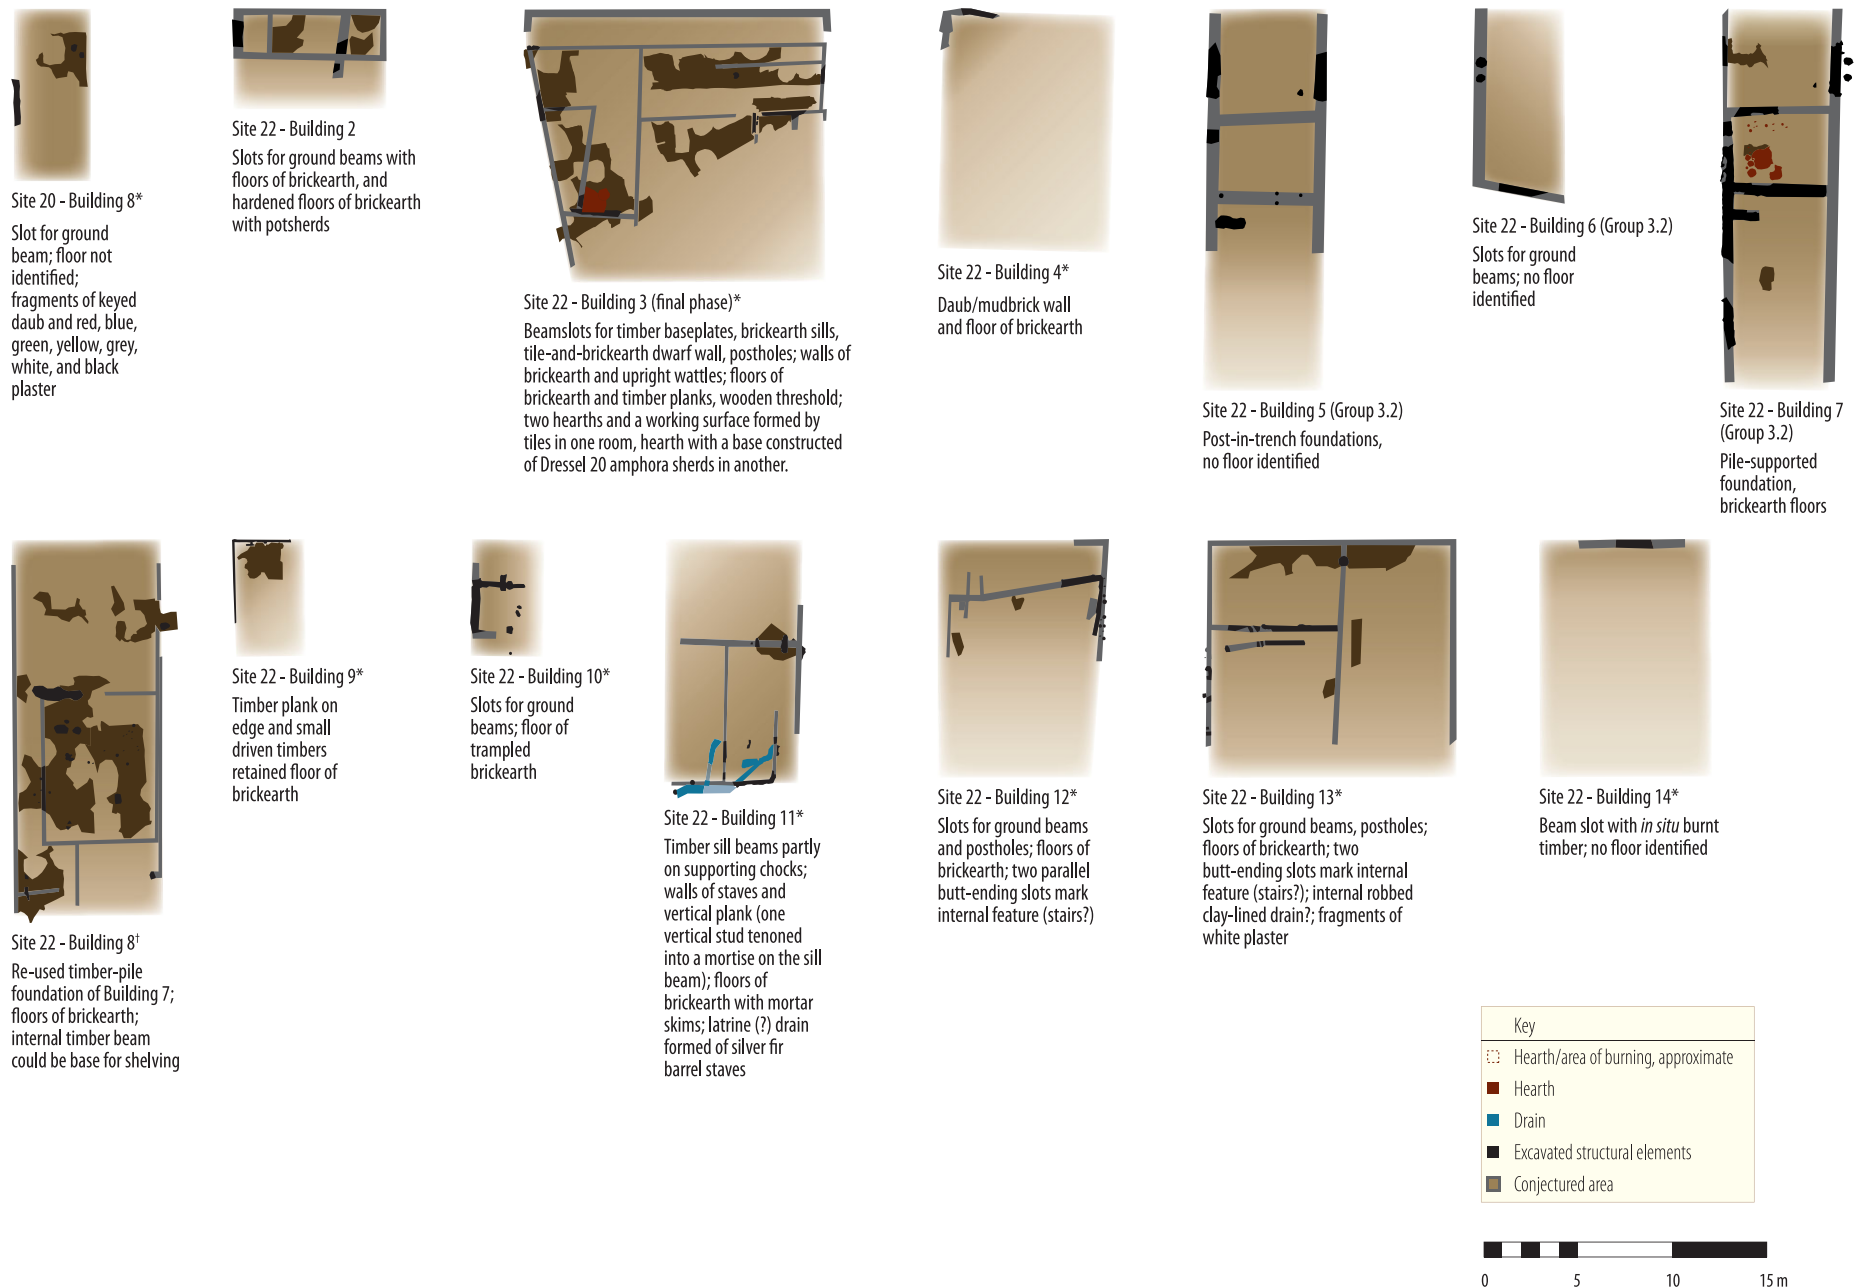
Late pre-Boudican building plans, Group 3. Top of each plan is the side nearest a road or the waterfront (i.e. the assumed 'front'). Asterisk (*) indicates a building burnt in the Boudican fire, cross (†) indicates a building possibly burnt in the Boudican fire. Scale 1 : 400.
